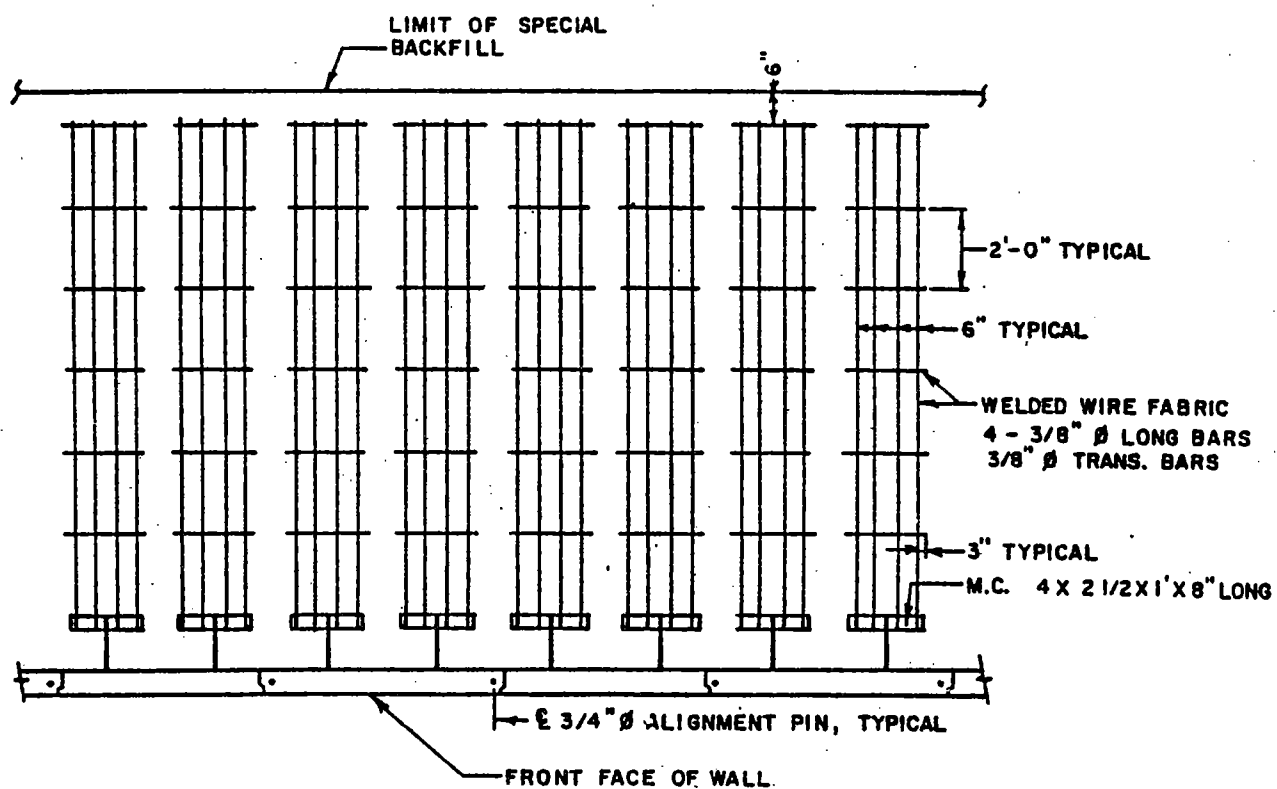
PLAN VIEW OF TYPICAL MAT ARRANGEMENT.
